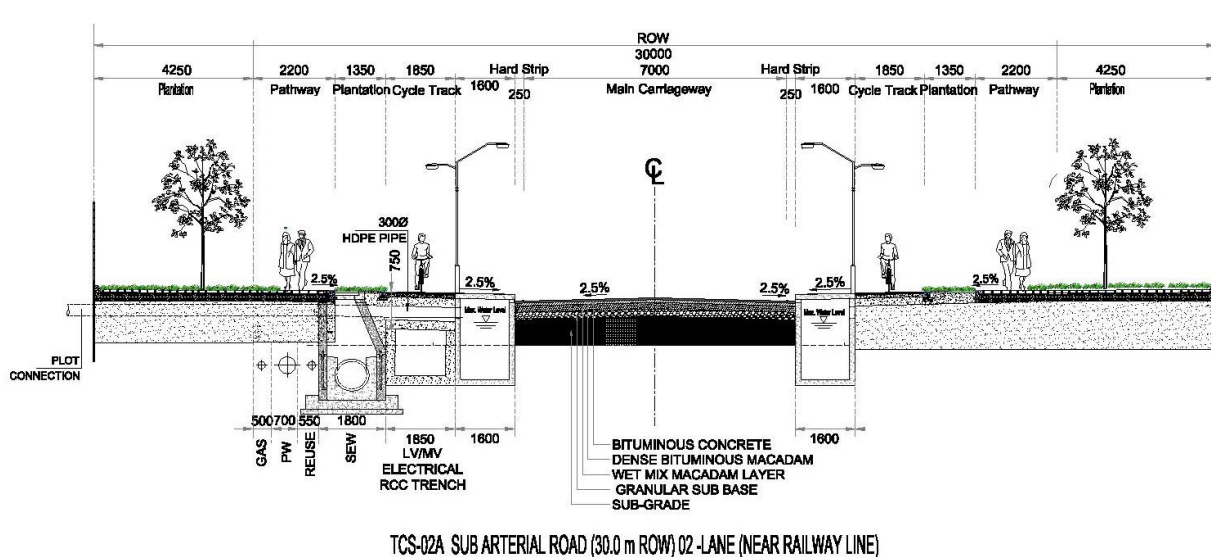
PROPOSED ROAD SECTION FOR SOUTH BLOCK-30M ROW,
